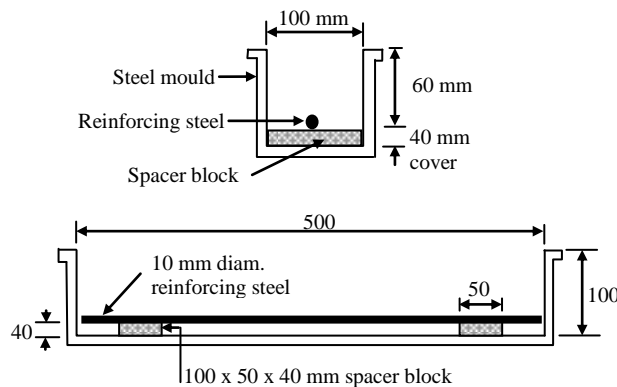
Positioning of reinforcing steel in the steel mould prior to casting
